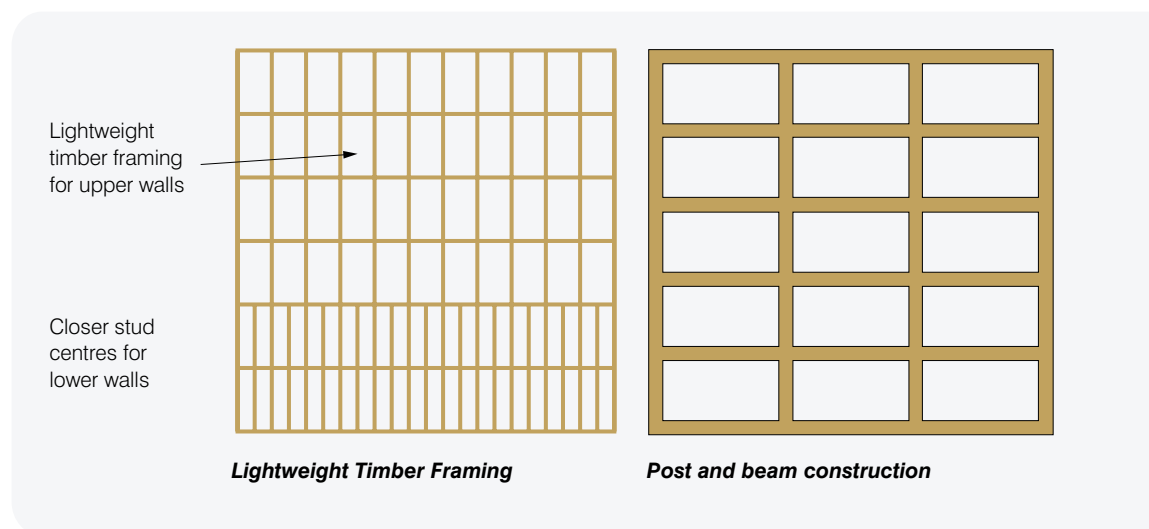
Schematic comparison of timber frame and post and beam construction.
